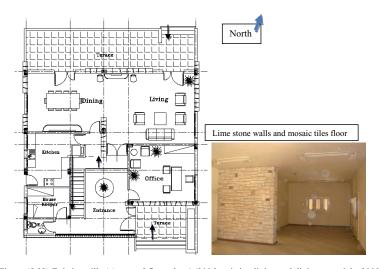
Existing villa (a) ground floor plan 1 /200& existing living and dining materials, 2009
